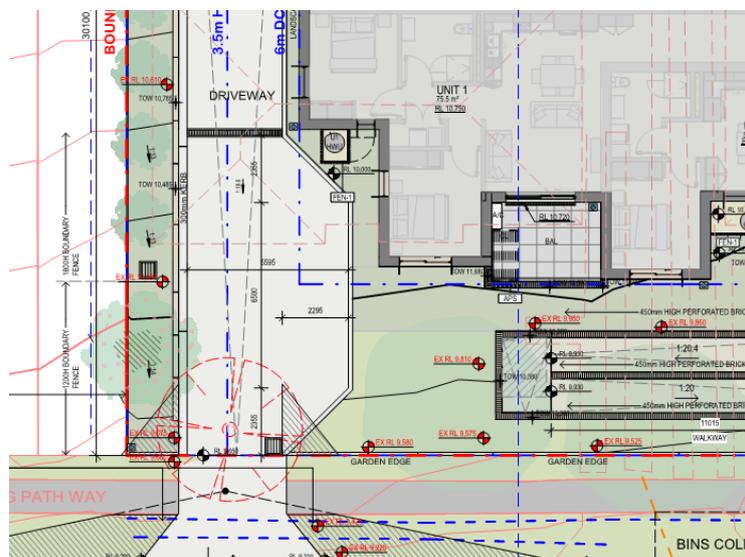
Proposed Passing Bay on Architectural Plans Rev H dated 16.05.2025
